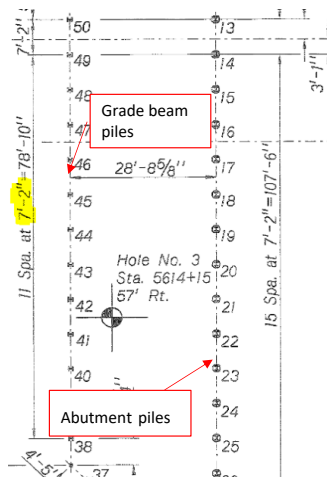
Top view – the spacing of abutment piles (right) and grade beam piles (left).
